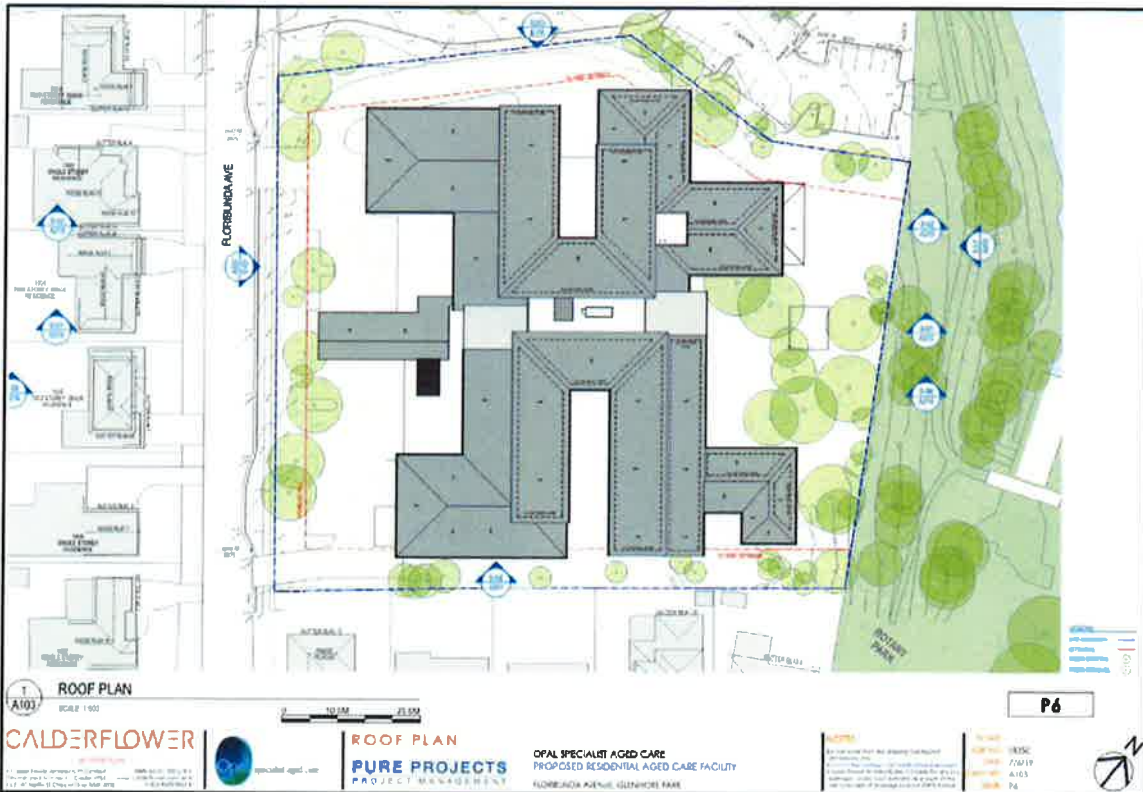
Proposed Roof Plan (Source: Calderflower Architecture, 2019)
